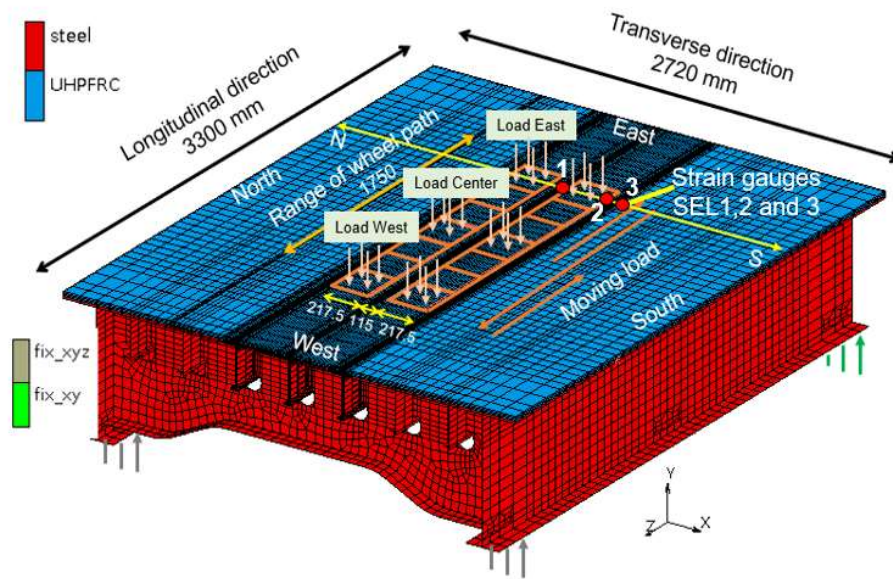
FEM model of UHPFRC-steel composite bridge deck subjected to a moving wheel loading with rubber tire under surface water condition.
